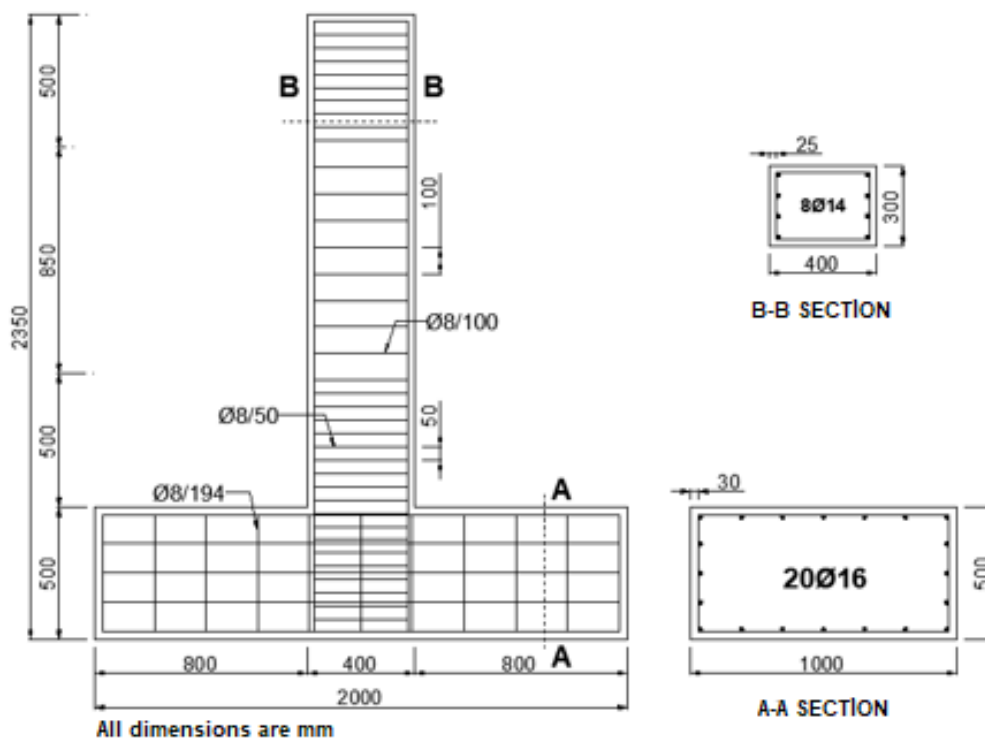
Reinforced concrete column cross-section and reinforcement arrangement.
